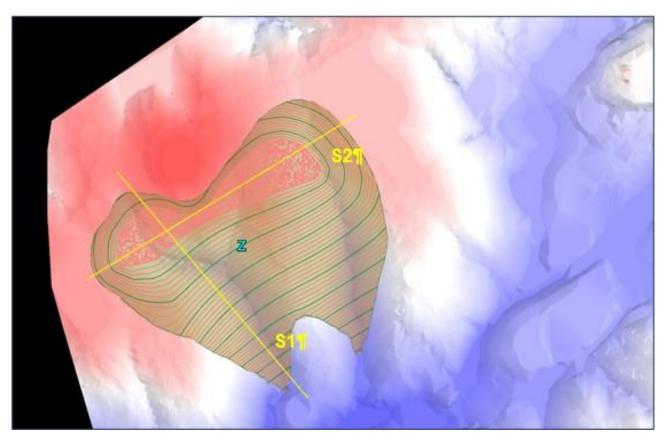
Waste Rock Stockpile Design Layout and Representative Sections
